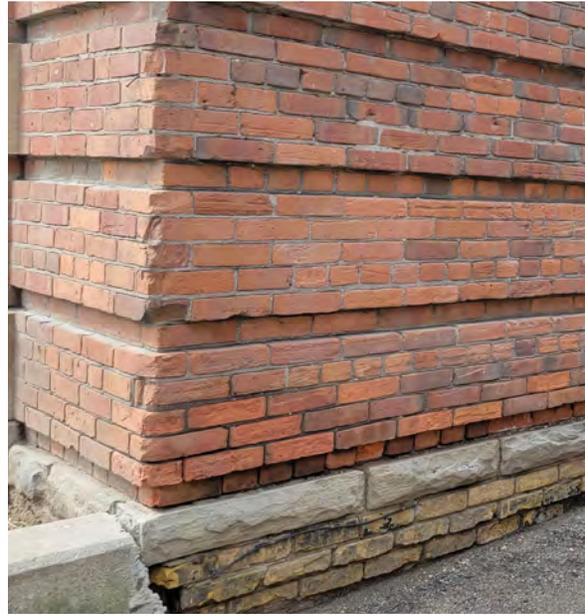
Brick on the North-east corner at grade with breakage, mortar loss, spalling and soiling (ERA, 2022).
